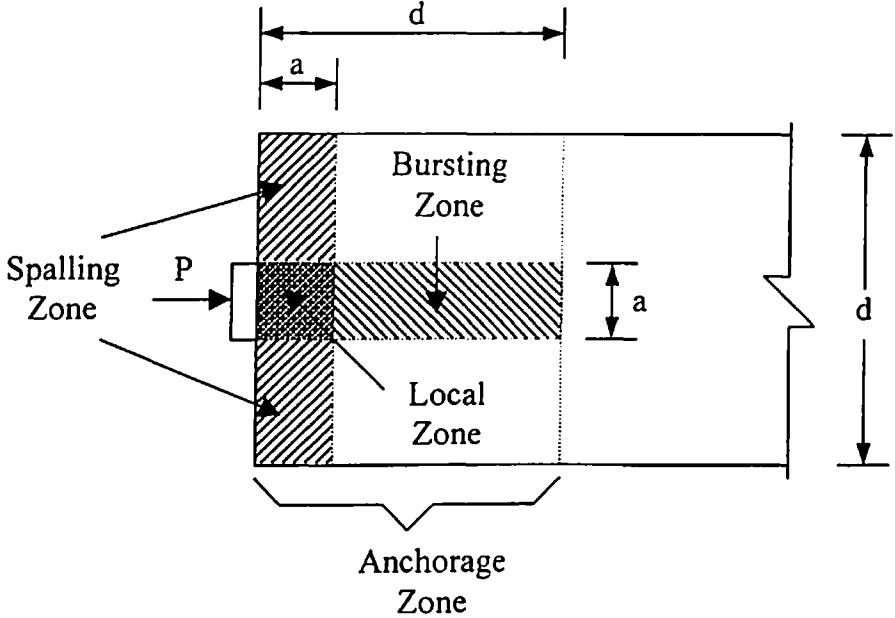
Anchorage zone in prestressed post-tensioned concrete beam
